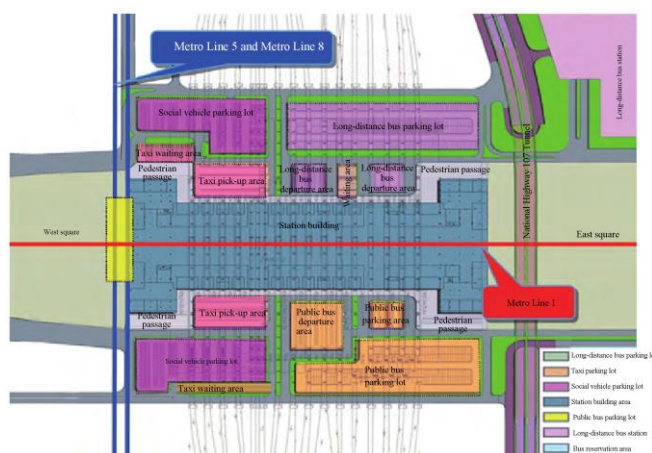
Overall layout of distributing facilities at Zhengzhou East Railway Station
